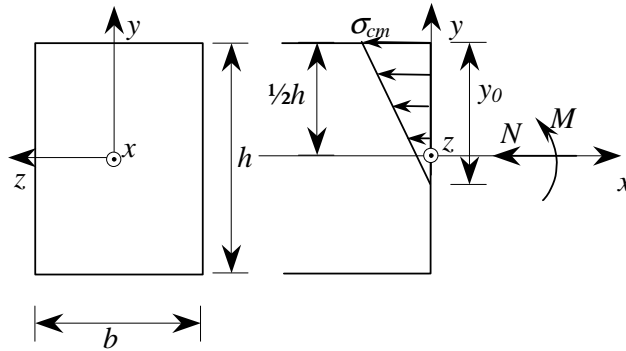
Cross section of unreinforced masonry (the bricks and joints are not shown)
